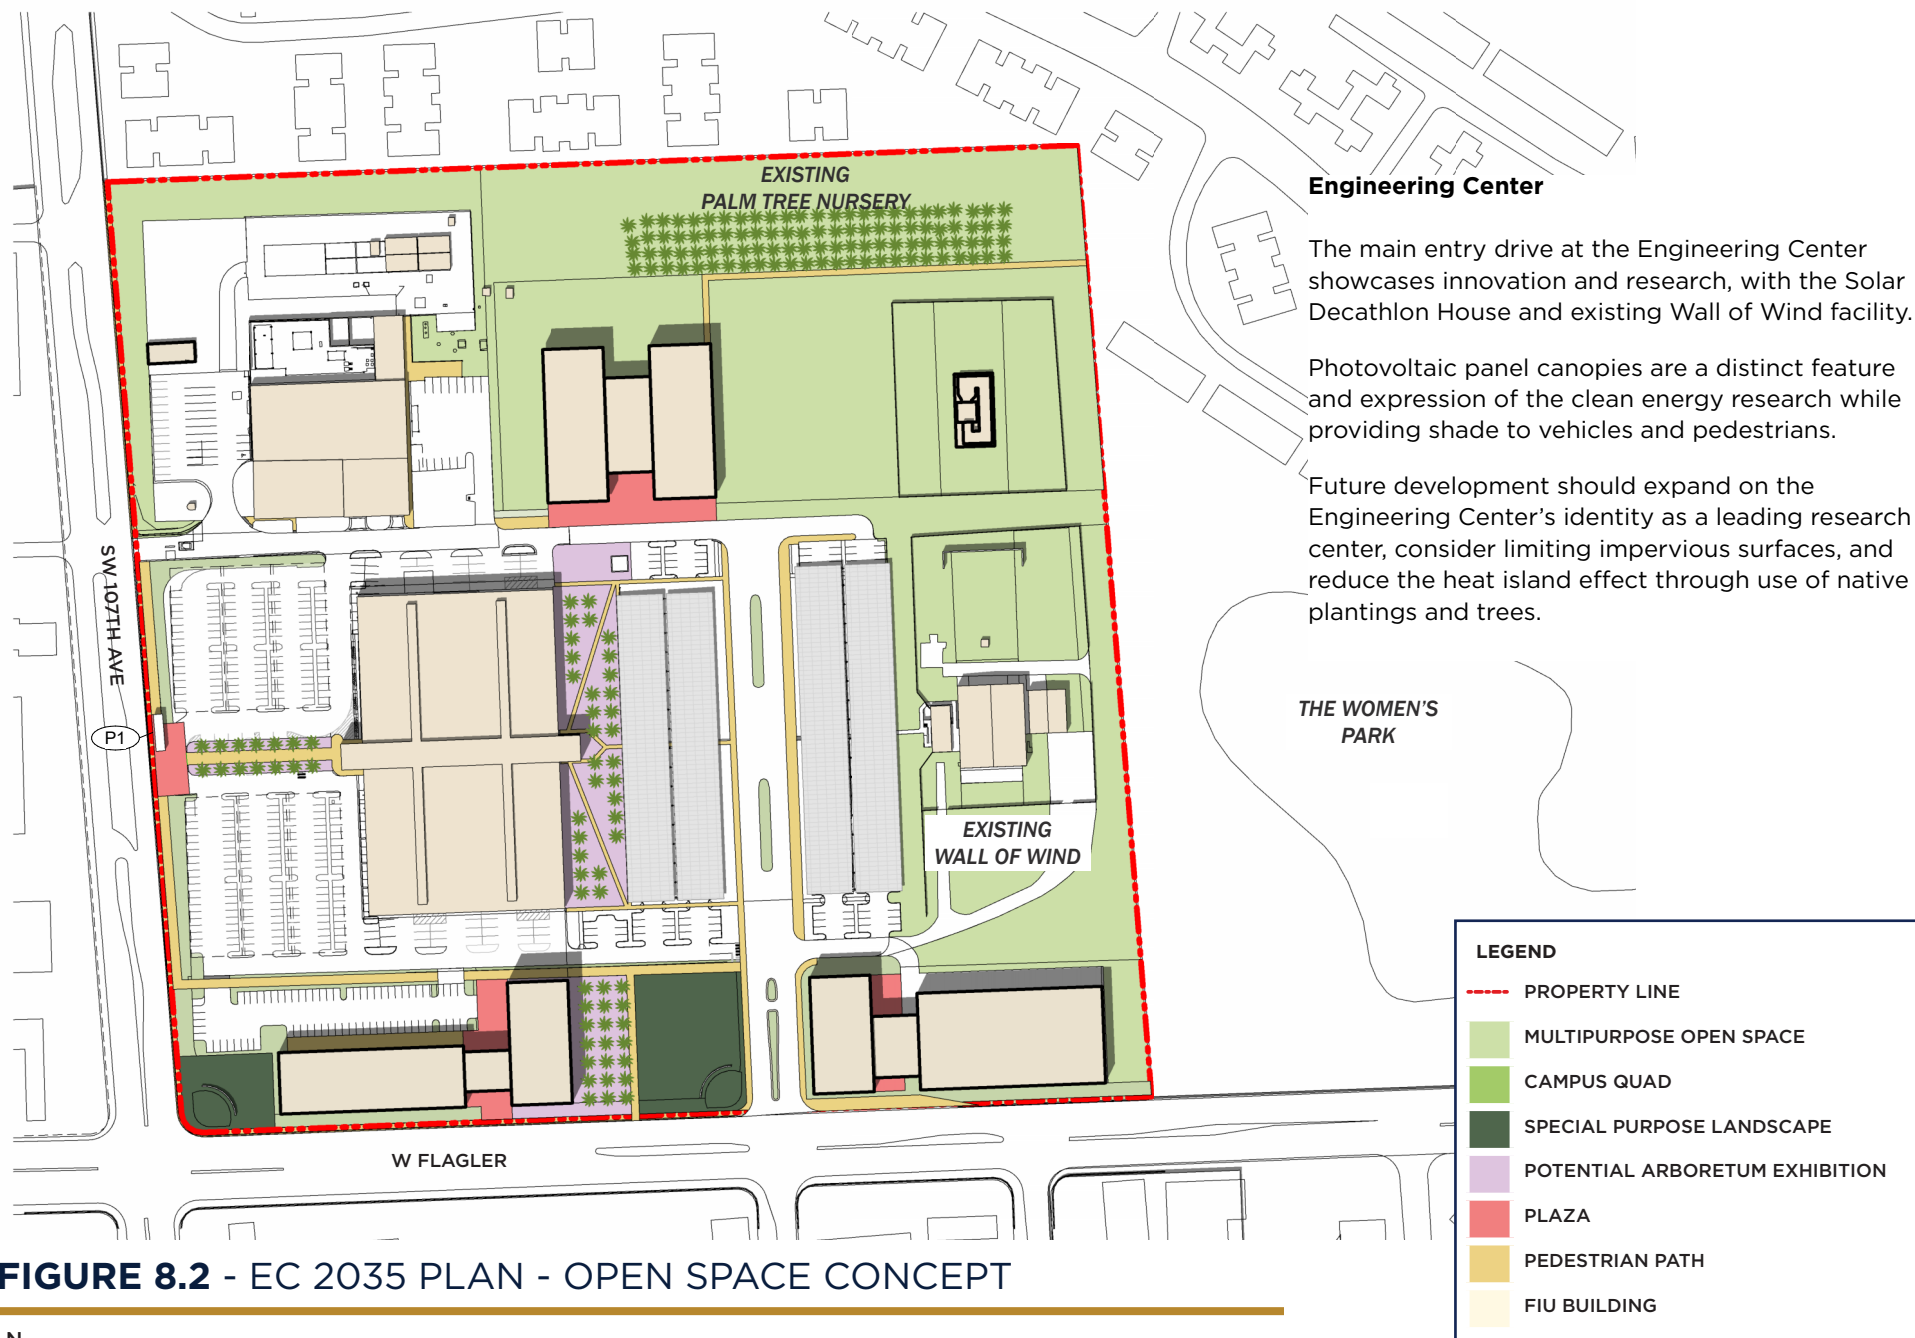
EC 2035 PLAN - OPEN SPACE CONCEPT
